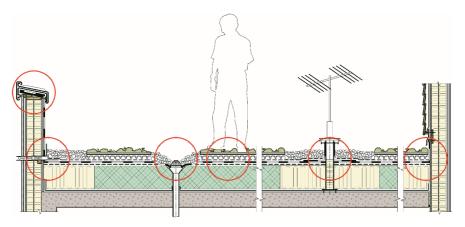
Points on a blue-green roof susceptible to water intrusion. From left to right: Flashings at the top of parapets, transitions between roof and parapet, drain, areas of high traffic, mounting brackets for technical equipment, and transitions between roof and adjoining walls (including doors). Illustration: Klima 2050/SINTEF.
